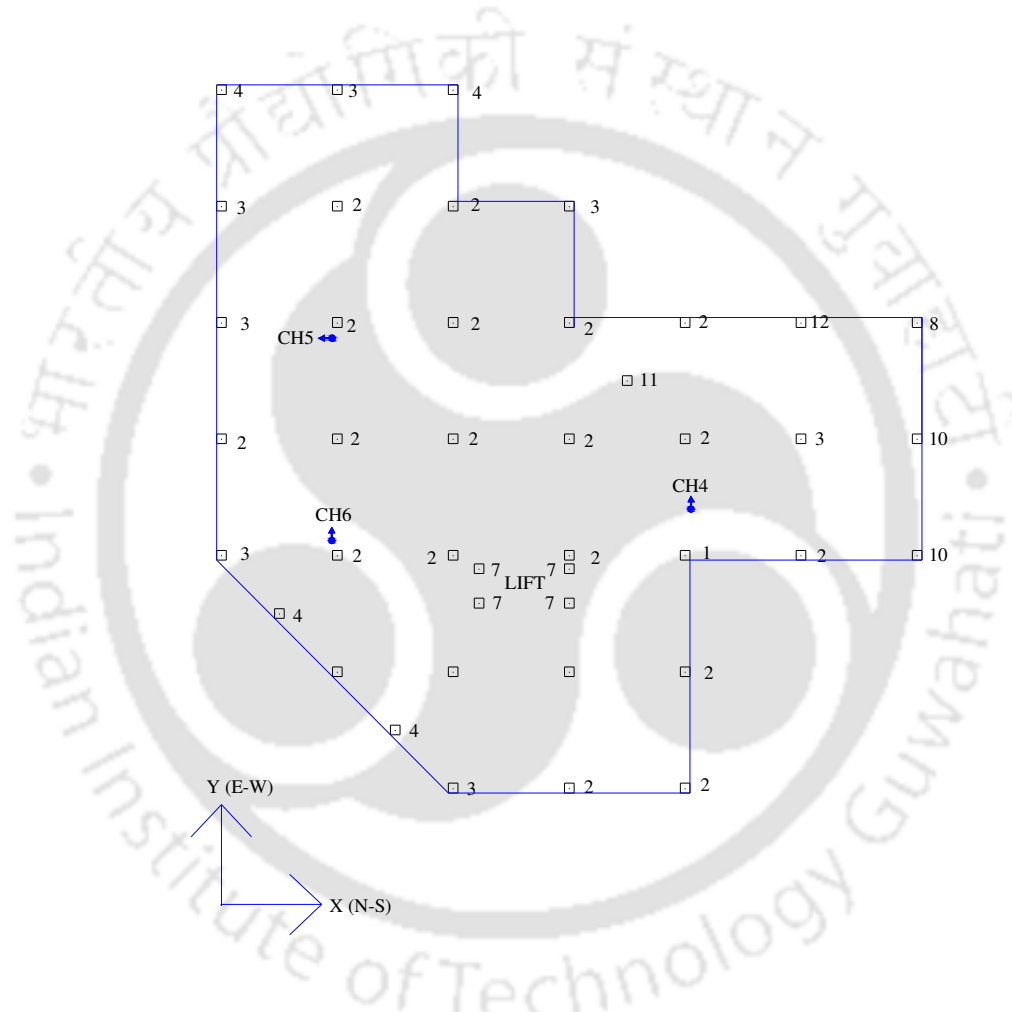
Plan showing column position and sensor location in the roof floor of torsionally coupled sample building
